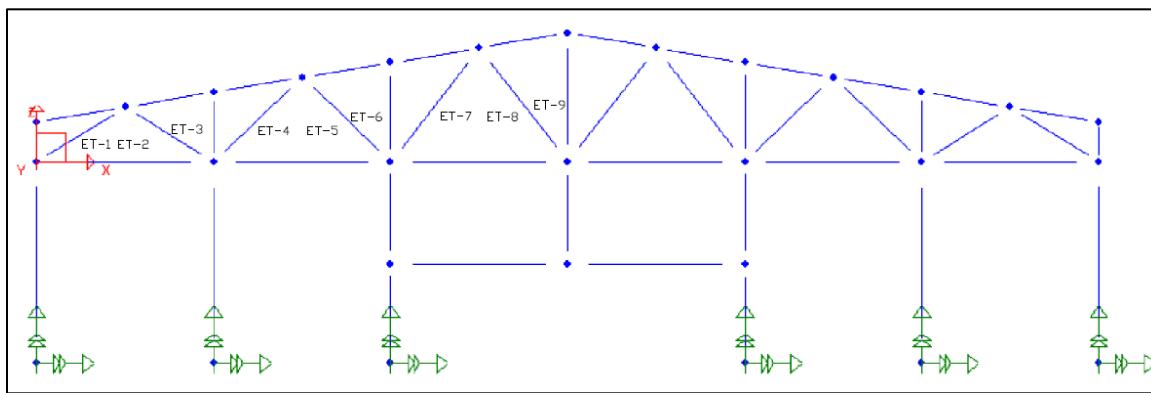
Exterior Truss, Gridline M, S-Frame Model Showing Member Numbers
